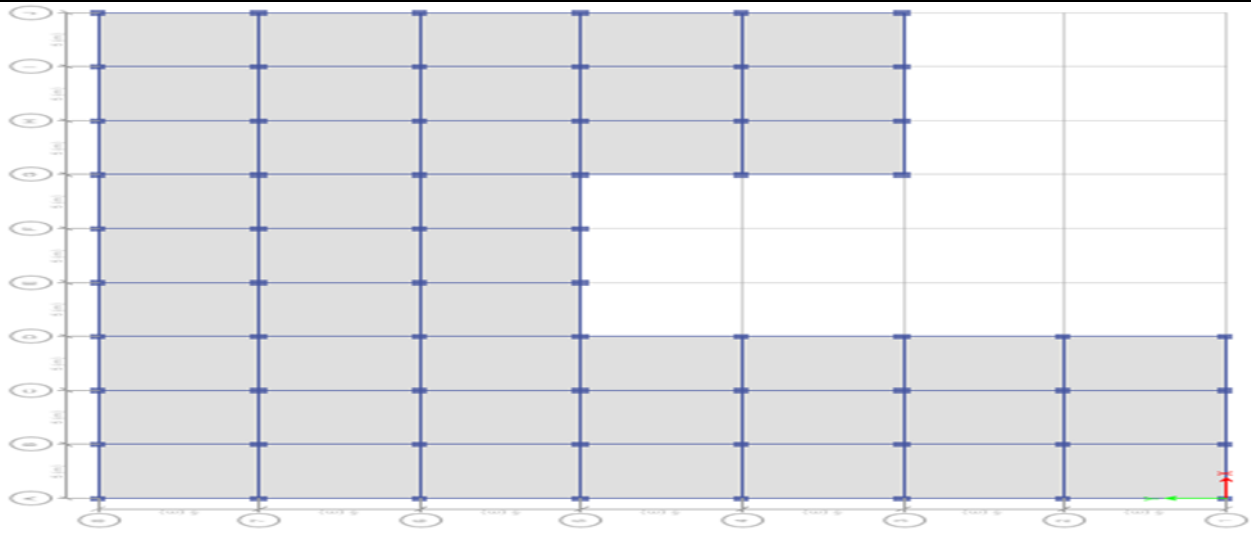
Plan view of C- Unsymmetrical type with blast loading
